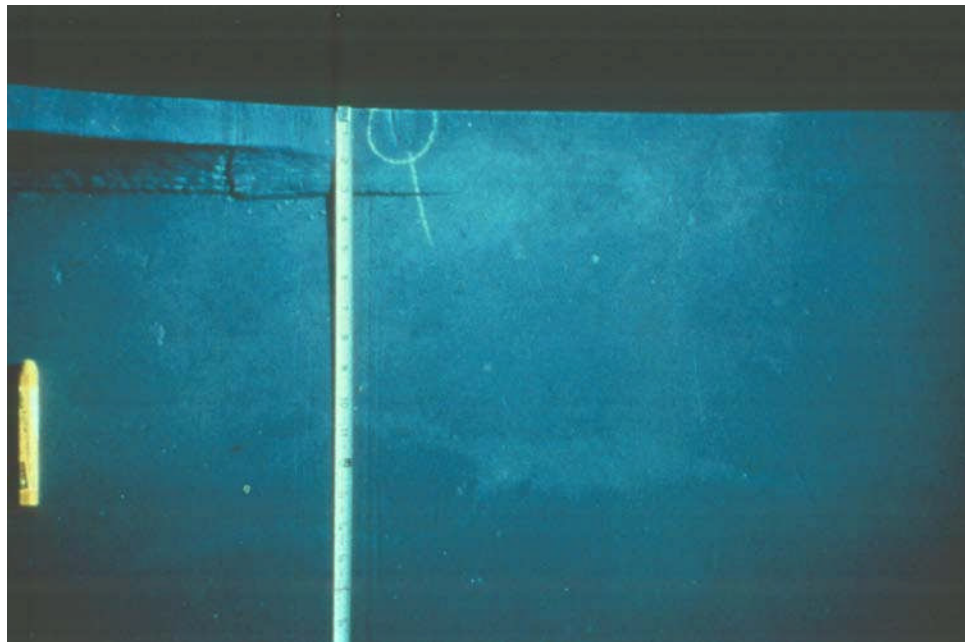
Insufficiently Ground Flame Cut of Gusset Plate for Arch to Tie Girder Connection
